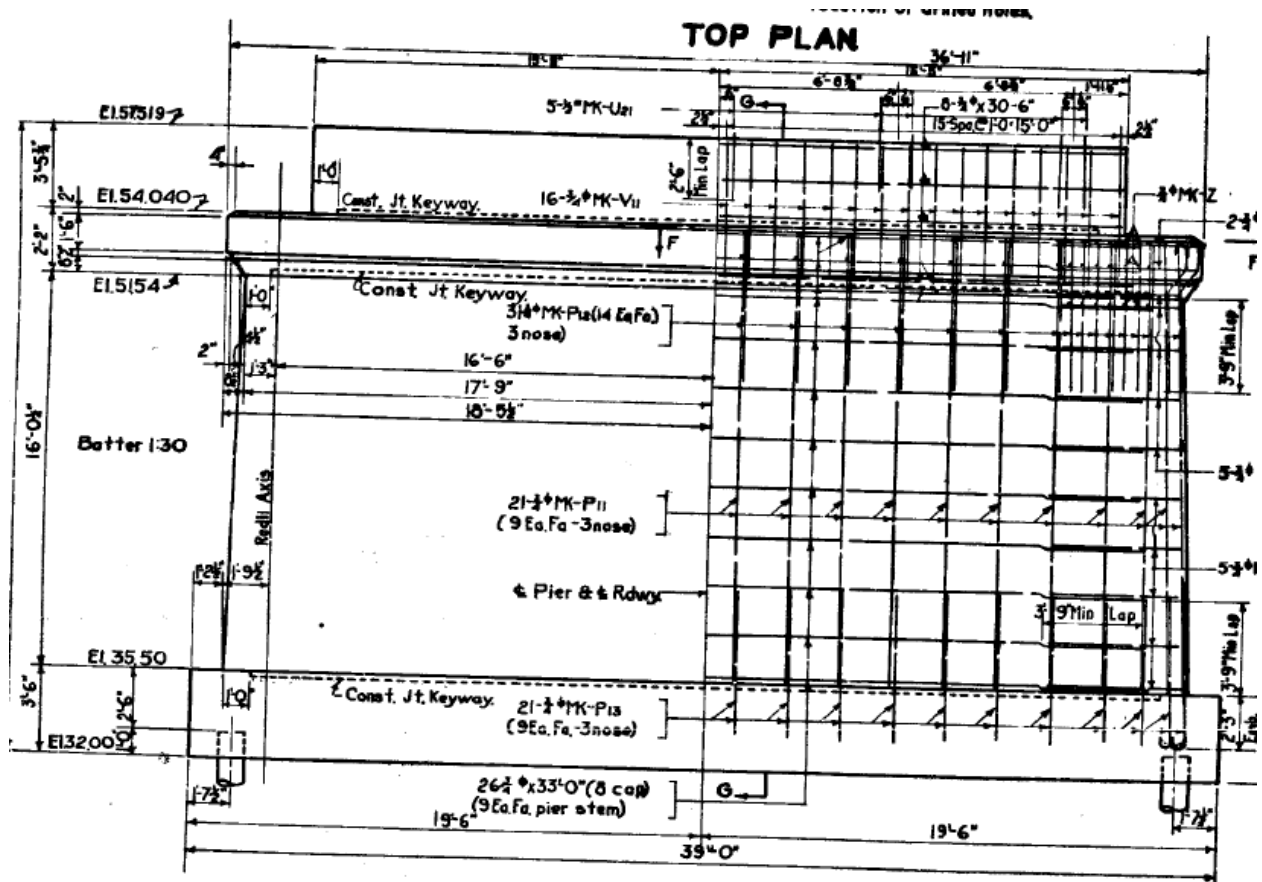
Transverse Elevation of Interior Pier (NBI 24210) (1971)
